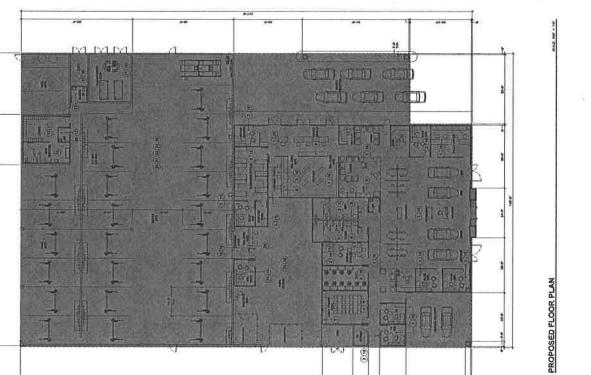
Exhibit D Floor Plan PD 13-006 & CUP 13-008 (Mullahey Chrysler)
